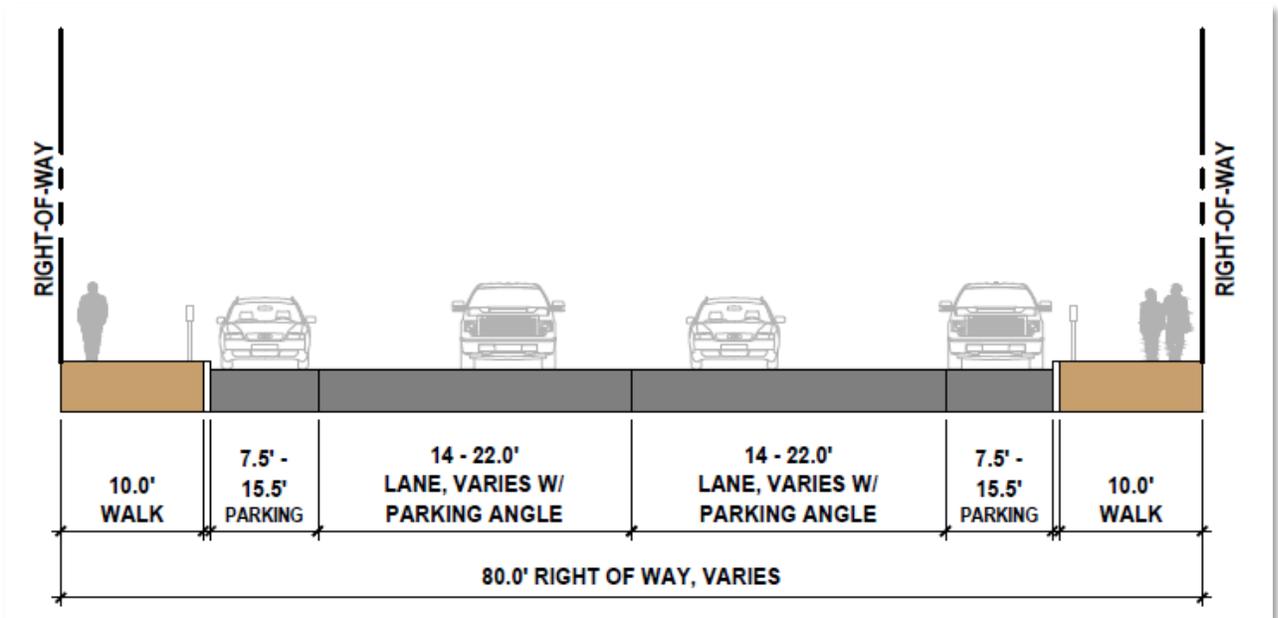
4th St - Existing Cross-Sections Between Colorado Ave & Rood Ave
